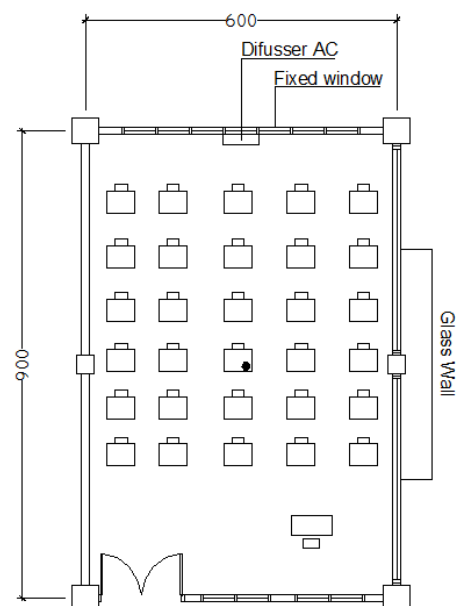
Floor plan of classroom C14, 1<sup>st</sup> floor
